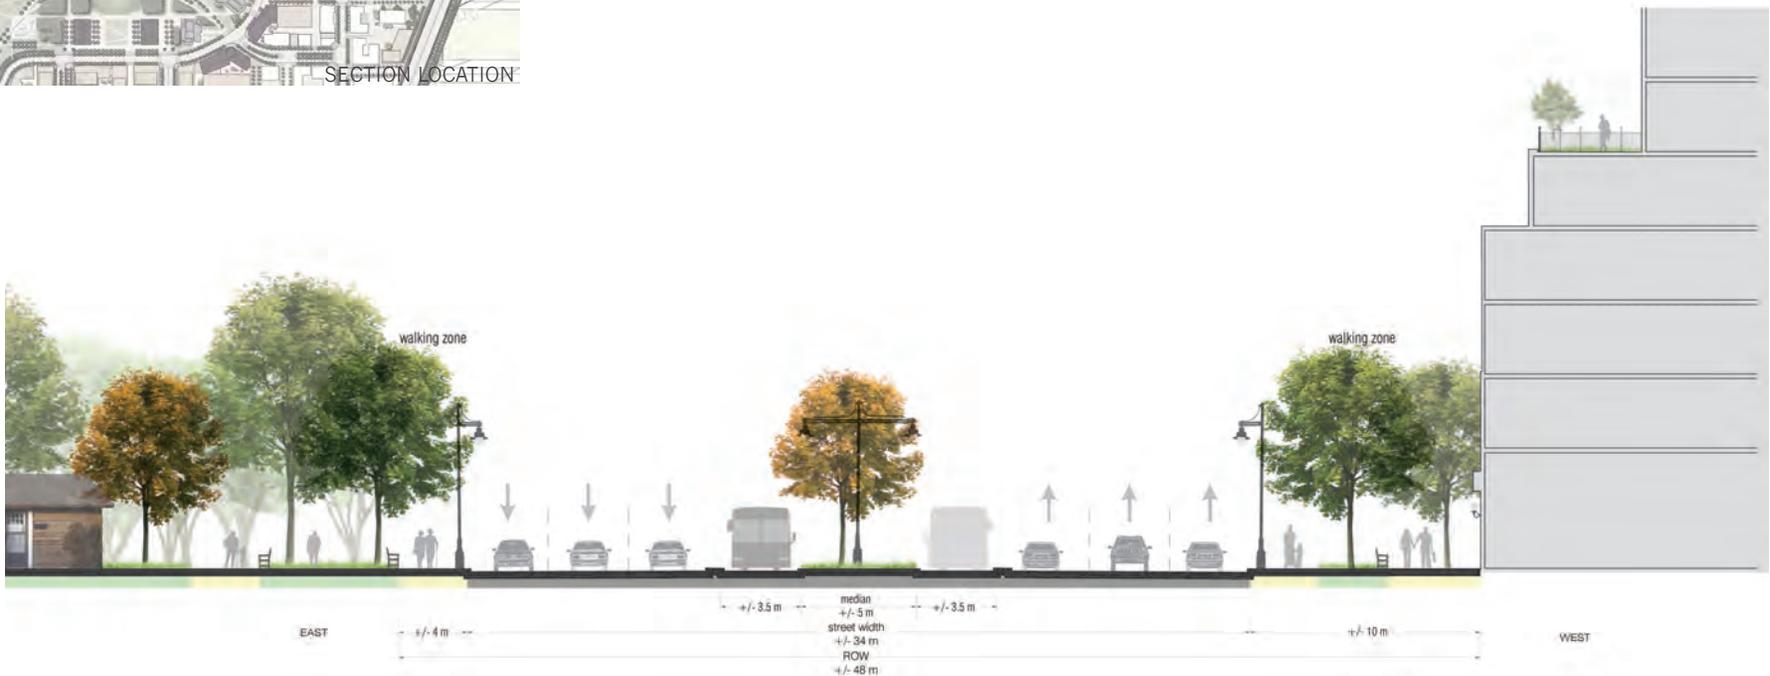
PROPOSED ST ALBERT TRAIL SECTION
